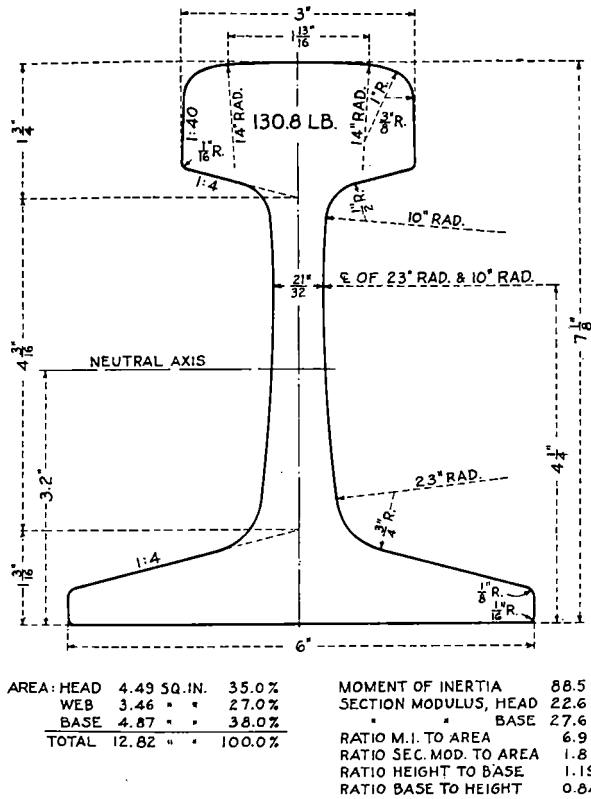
Modified AREA 131-RE Rail Section (U.S. Steel #13128).
